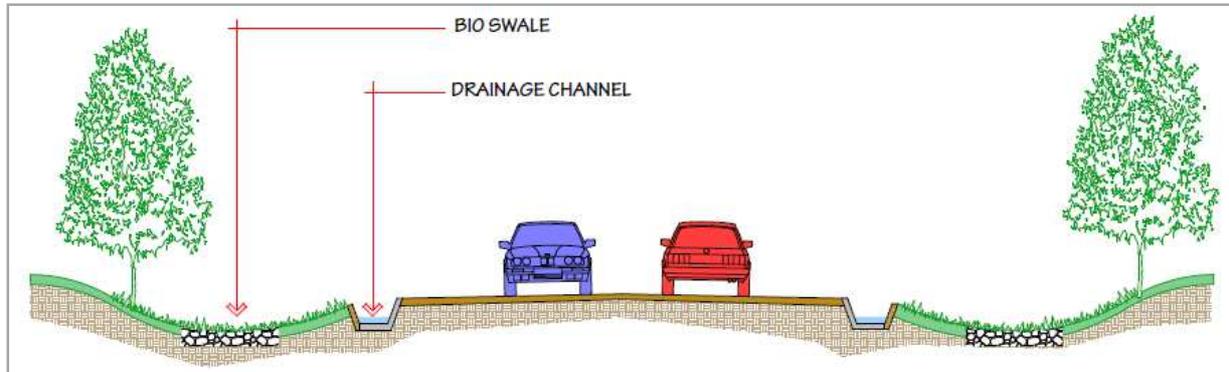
Cross-section of a main road (Makongo – Goba road at Kibululu) (Section E-E in Figure 4)
